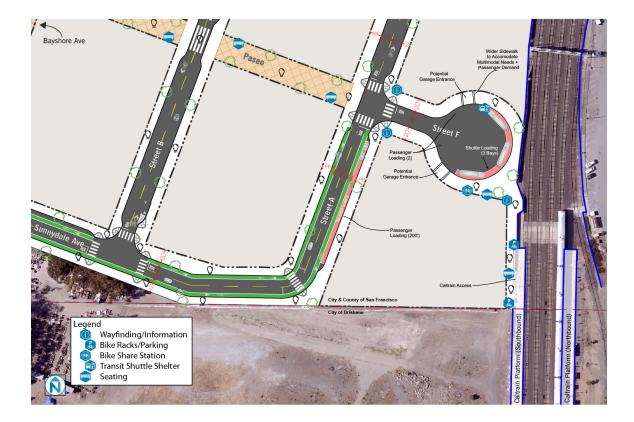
Bayshore Multi-Modal Facility Alternative 1
